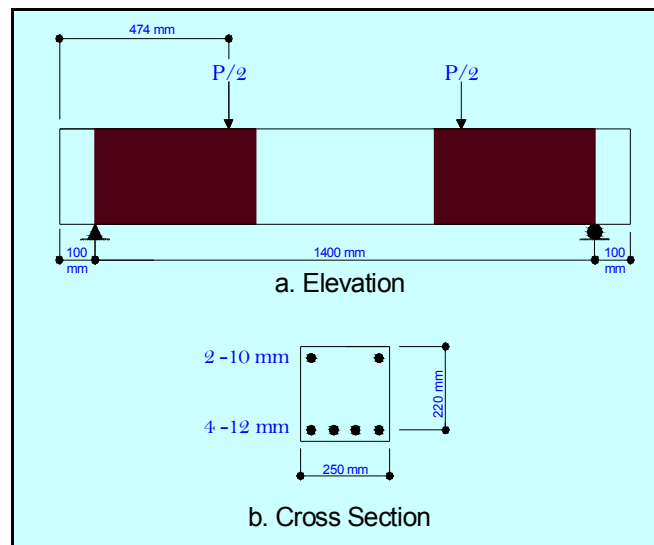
Dimension and loading arrangement of RC U wrapping beam.
